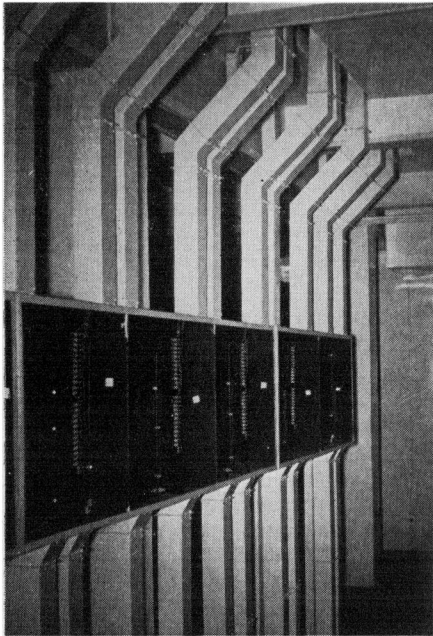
Enclosed vertical troughs at Moraga Substation, East Bay Division
